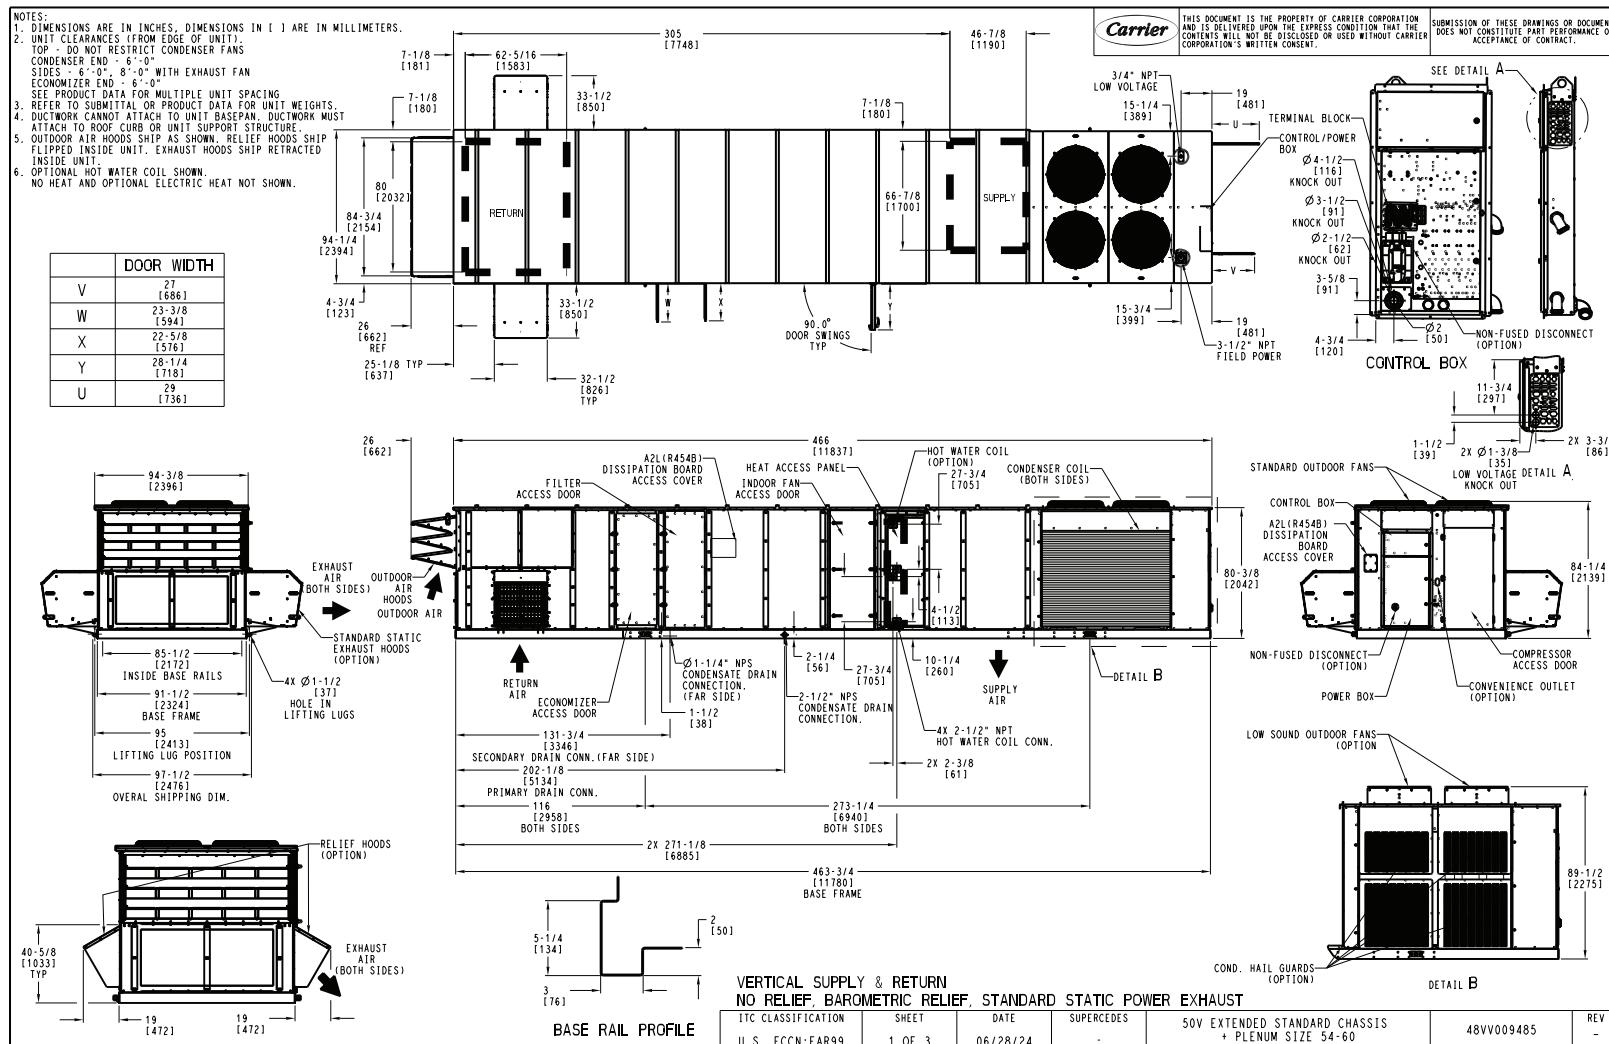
50V 55-60 Ton Extended Standard Chassis with Plenum Section
